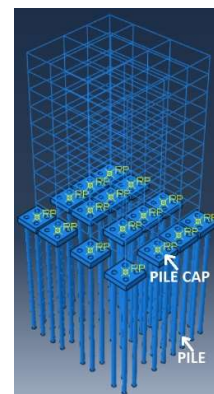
Pile footing embedded in the soil tetrahedron
